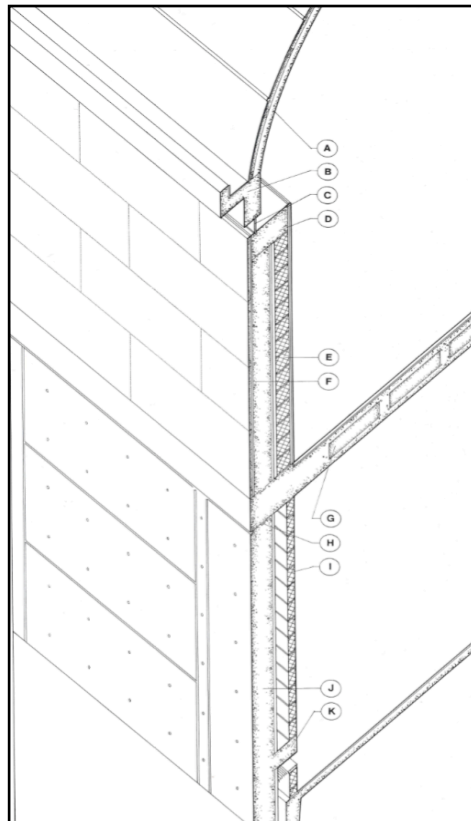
section of Kimbell Art Museum's Cavity Wall and hollow slab (Ford, 1996, p.330)
